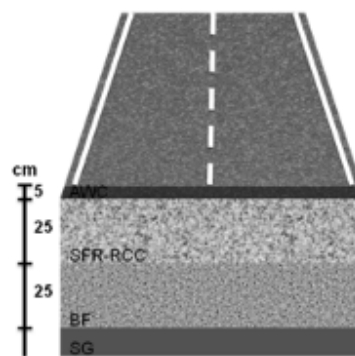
Demonstration pavement design (AWC: asphalt wearing course, BF: ballast foundation, SG: sub-grade)
